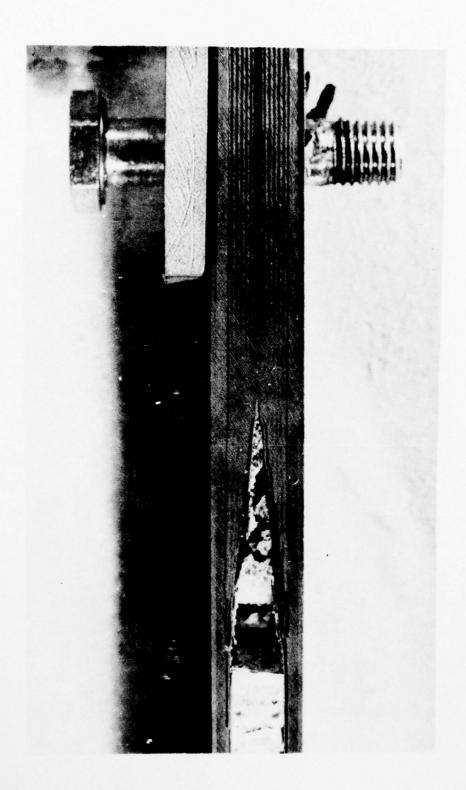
DETAIL OF $\underline{\mathcal{Q}}$ AXIAL LOAD SPECIMEN TEST FAILURE
